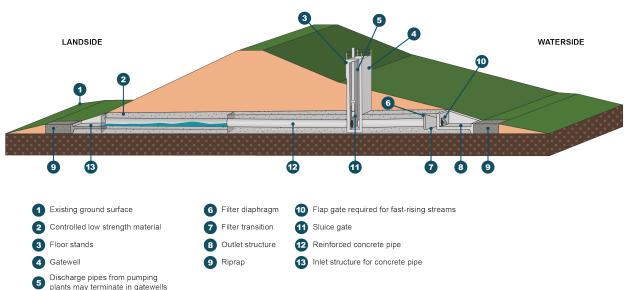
Typical Drainage Pipe Penetration—Embankment Levee
